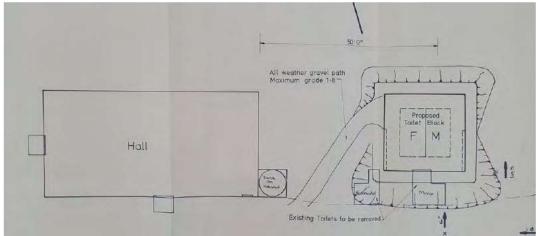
Plans showing the proposed toilet block to be built at the rear of the hall, 1975. (PROV 1925-85, Public Building File)
